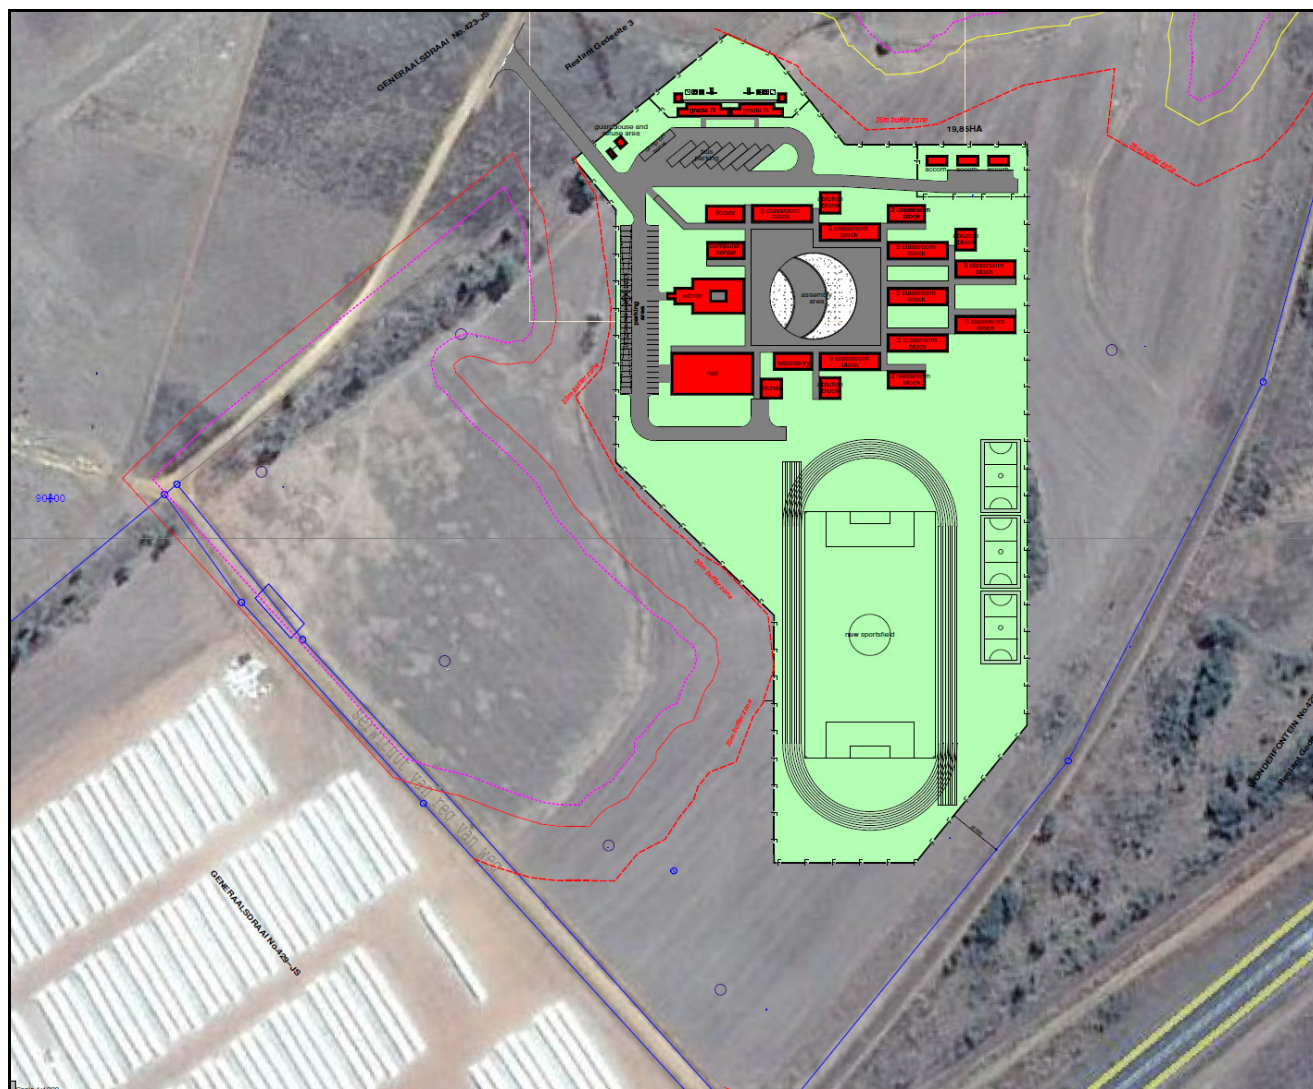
Layout Plan No 3 (taken from Bakopane Architects, 2016)
